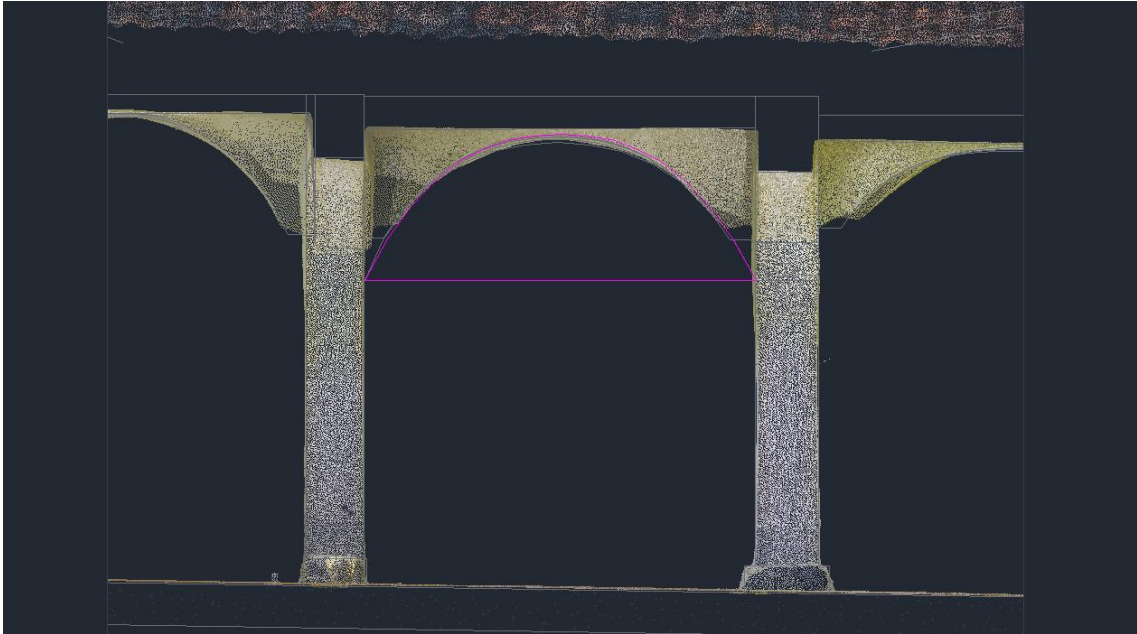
Longitudinal section of typical church vault with void volume silhouette based on point cloud data.
